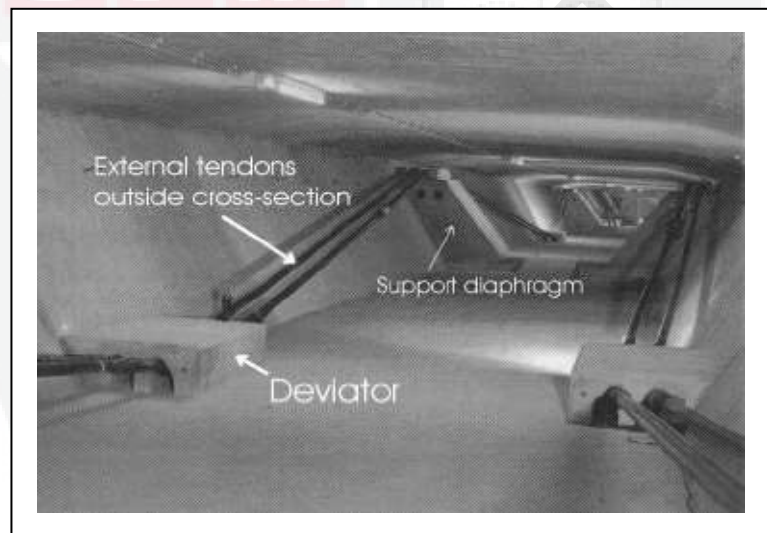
Box girder bridge with externally deflected tendons (mysite.wanadoo-members.co.uk/jens/thesis/1_externalPrestress.pdf, 2001)
